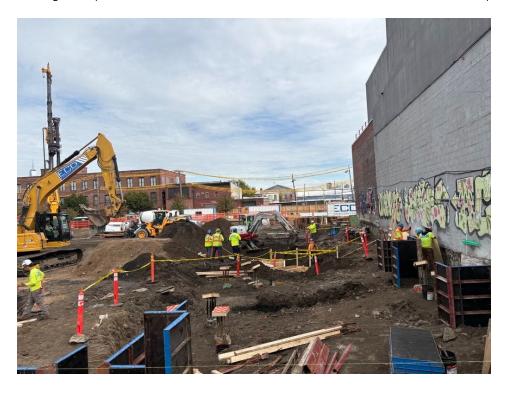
ECD excavating to crush/form pile caps (facing northeast)
